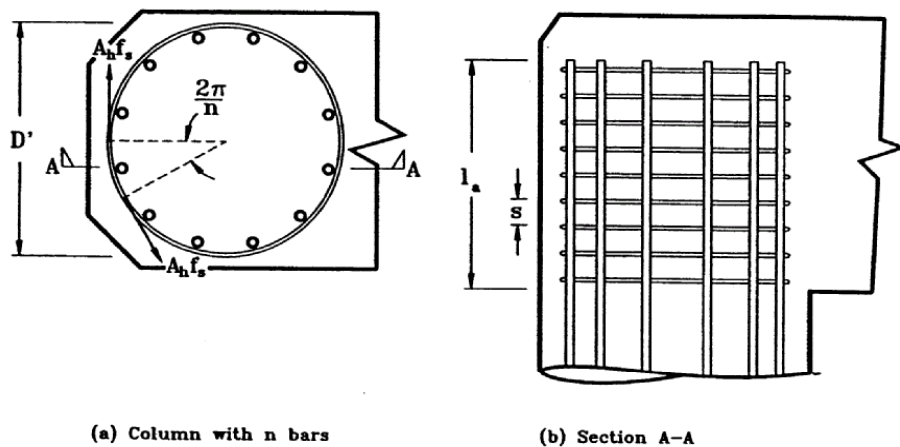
Anchorage by Lateral Confinement (Adapted from Priestley et al., 1996)
